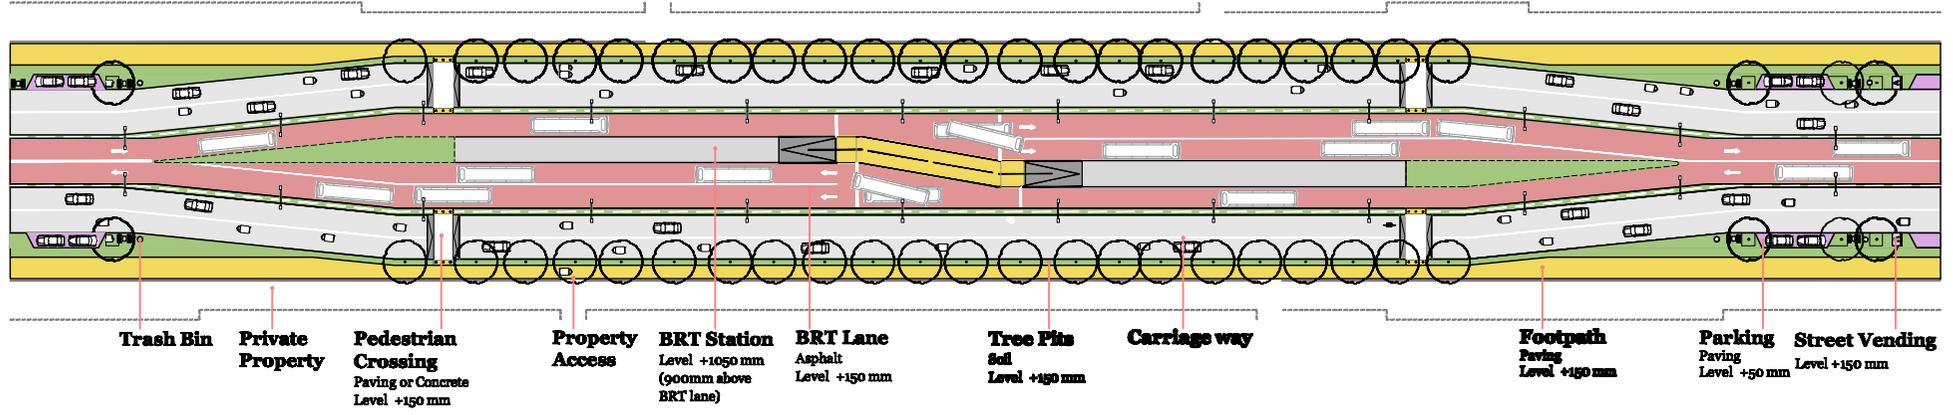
Plan showing typical design for BRT corridors with 36 M ROW
